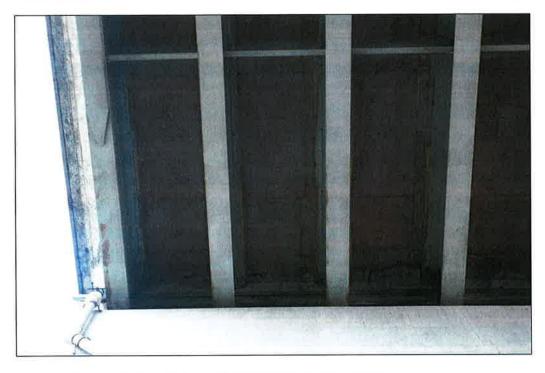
Typical Condition of Soffit (Bent 301-302) (fair-to-poor condition – stained and unstained cracking, delaminations, spalls, patches, wet areas and light scaling)
